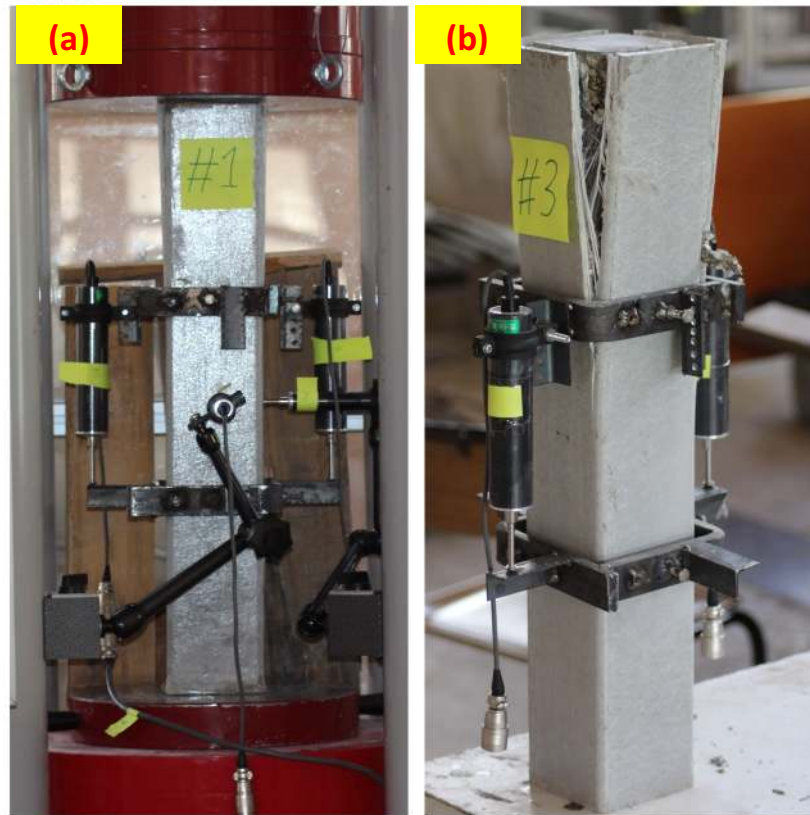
(a)&(b)-LVDTs installation and test configuration.
